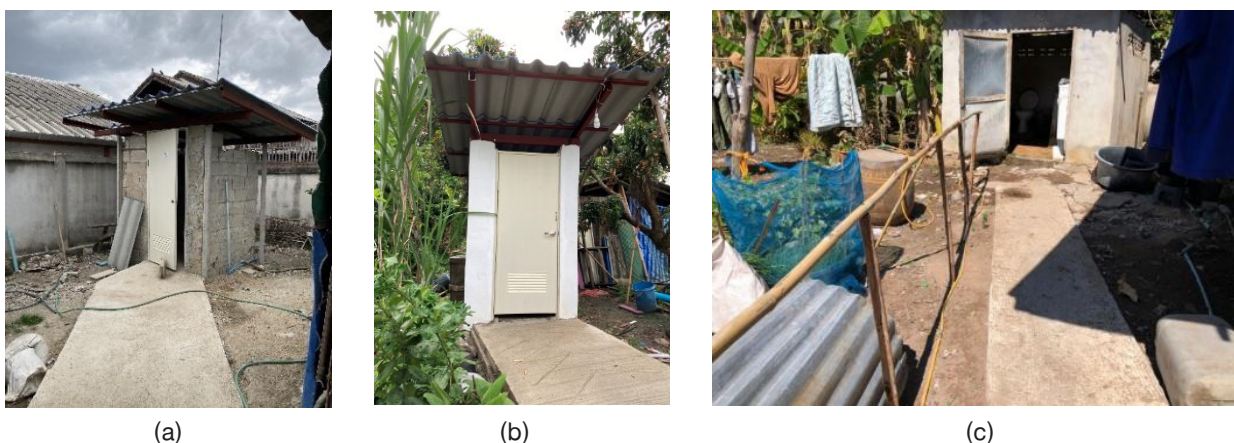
Bathroom shelters outside the house after modifications: (a) House A in the north; (b) House B in the north; and (c) House C in the northeast. (source: photos by author, 13 Mar 2021 and 25 Aug 2022)
